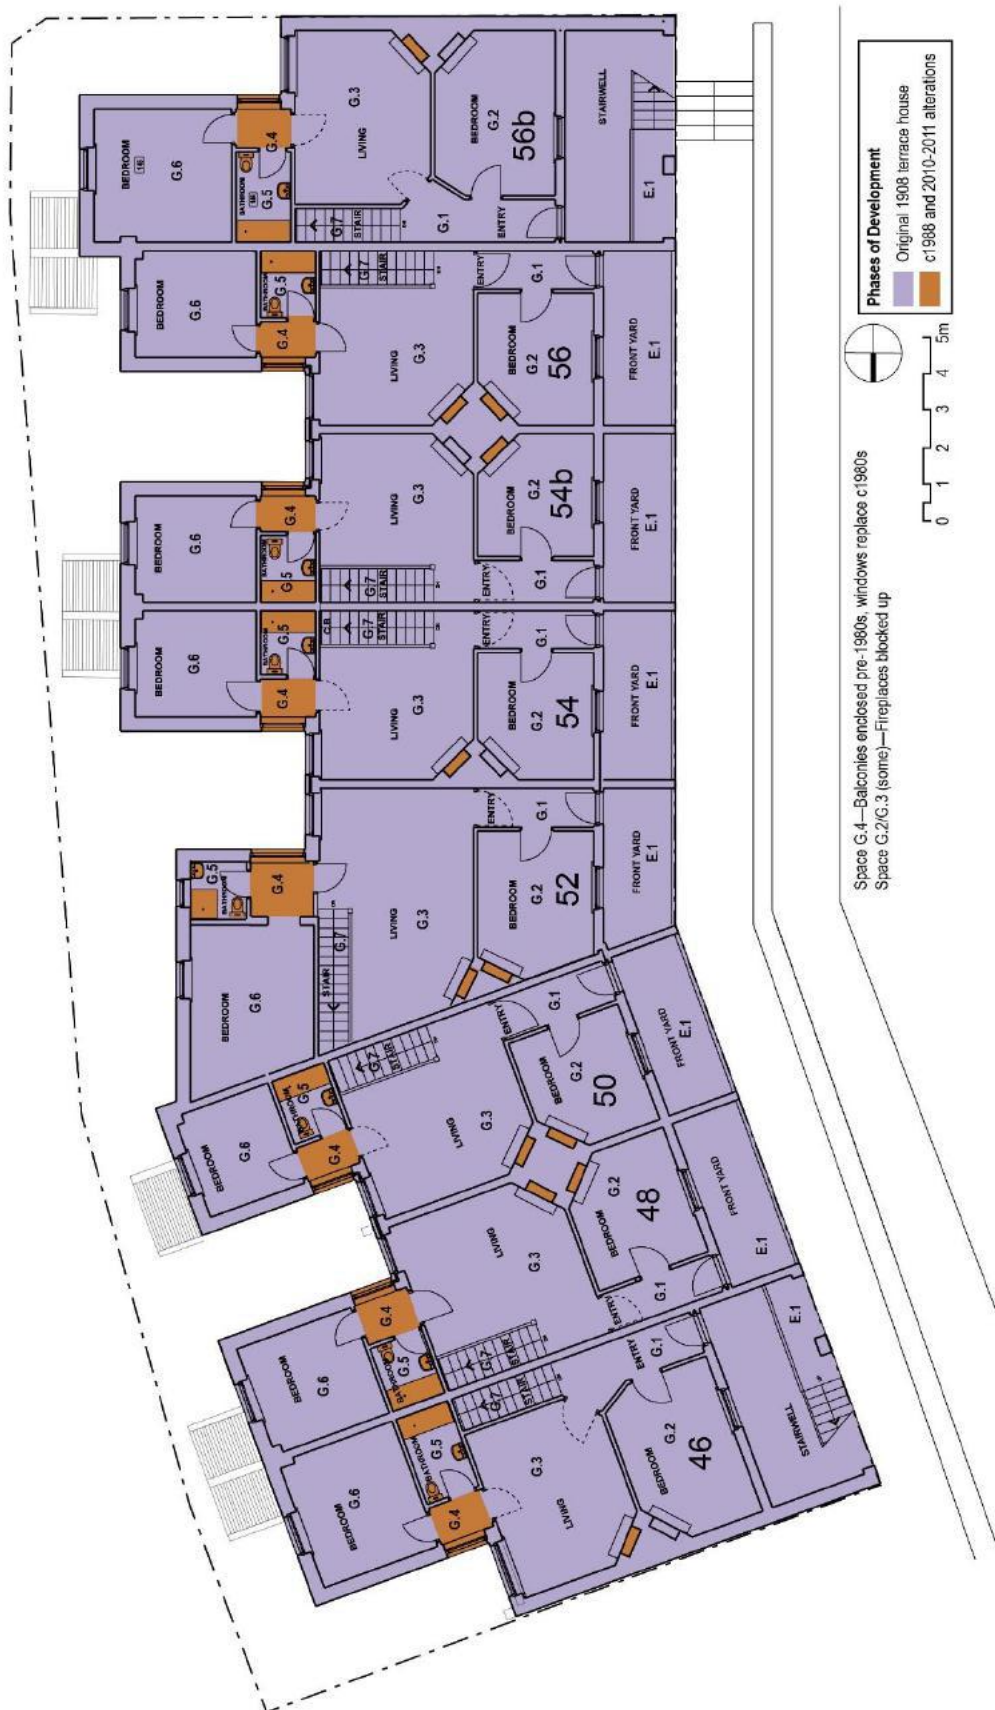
Diagram showing periods of construction—ground floor plan (lower flats). (Source: LAHC, with GML overlay 2016)
